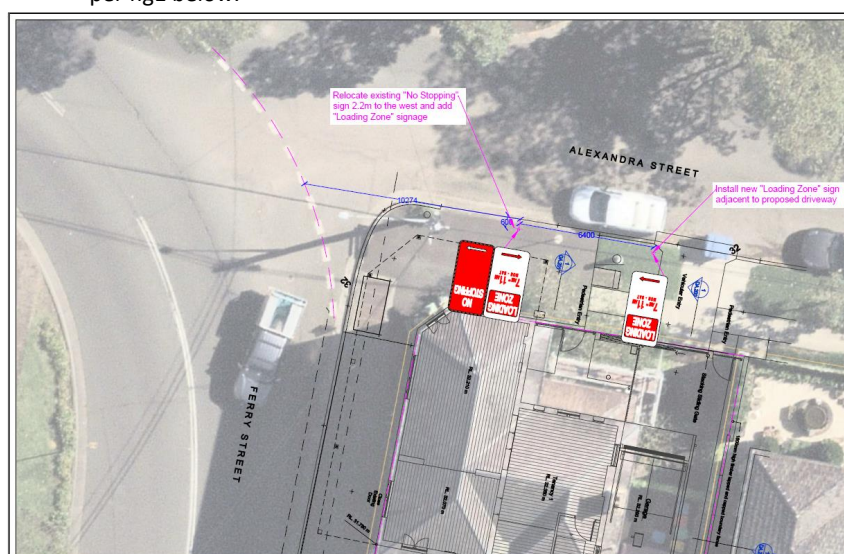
Signage Plan for 'Loading Zone' and adjustment of 'No Stopping' sign as per plan No. 2022-1055-02A issued by McLaren Traffic Engineering
